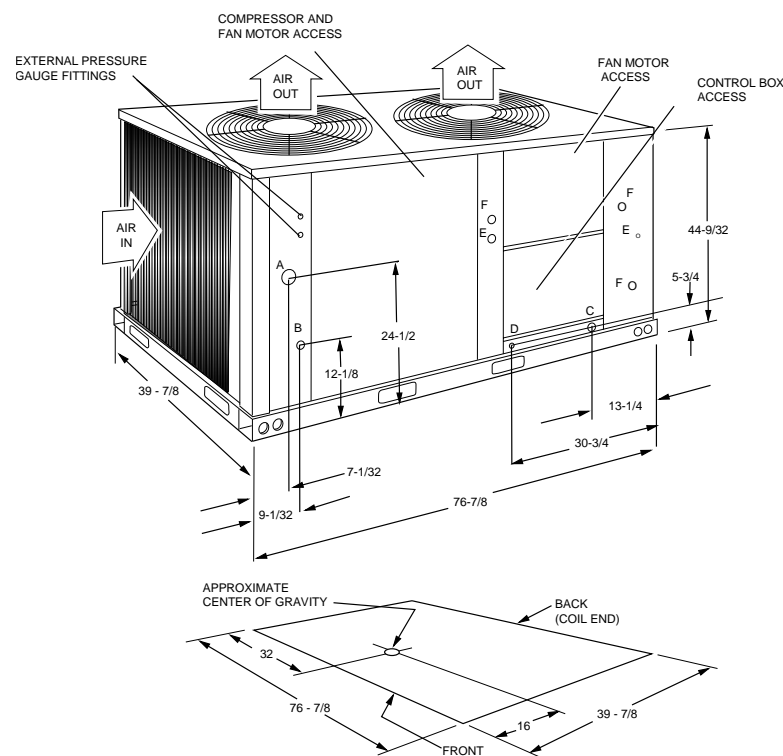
UNIT DIMENSIONS AND CLEARANCES
